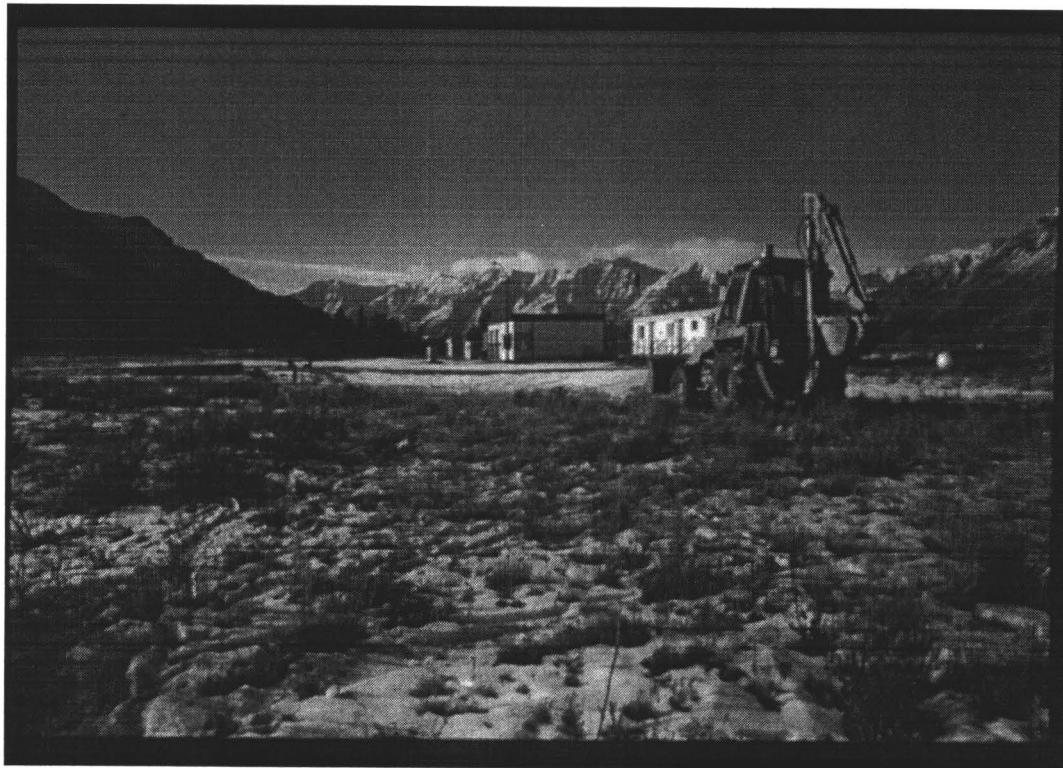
GPR Site #1 from northeast corner looking southeast.
